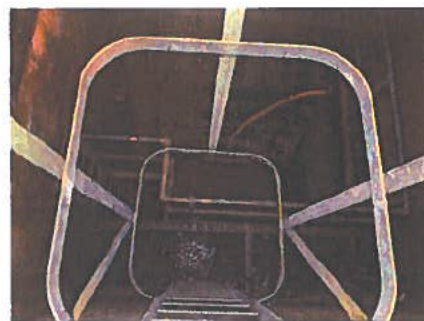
Crumbles Outfall – Outer chamber (Beach) access arrangement.
